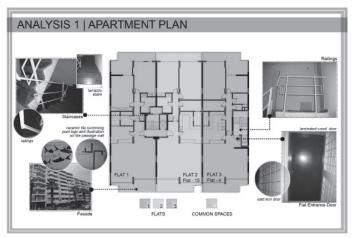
Analysis of Pıtrak Apartment Building; plan layout and materials (© Author's archive).
